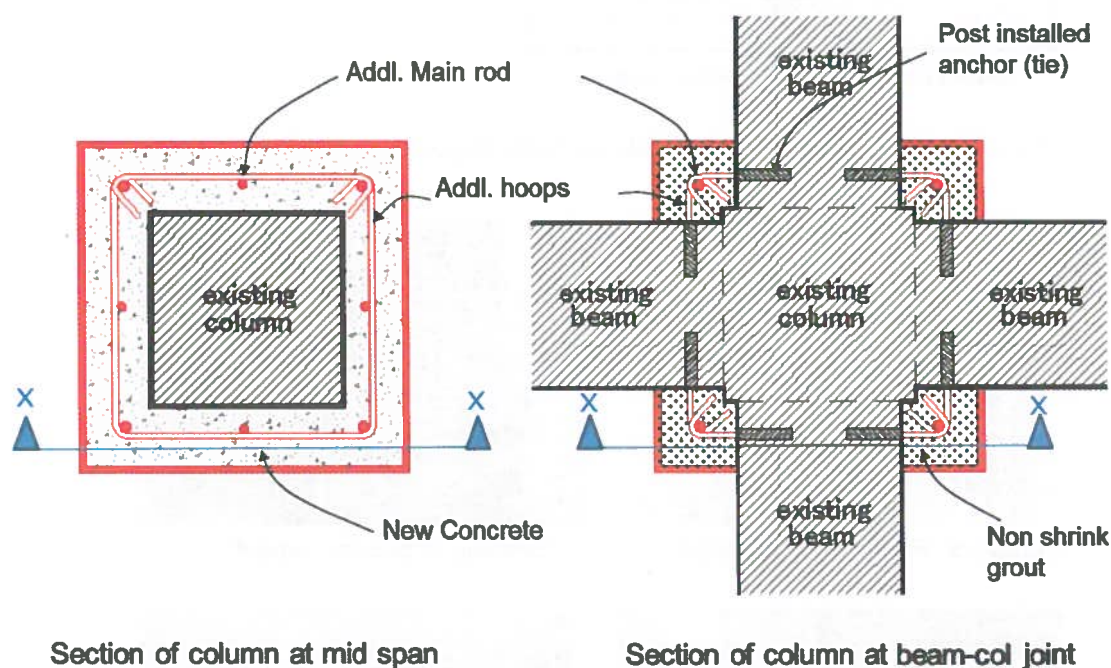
Typical Details of Column Jacketing Showing Cross Section
